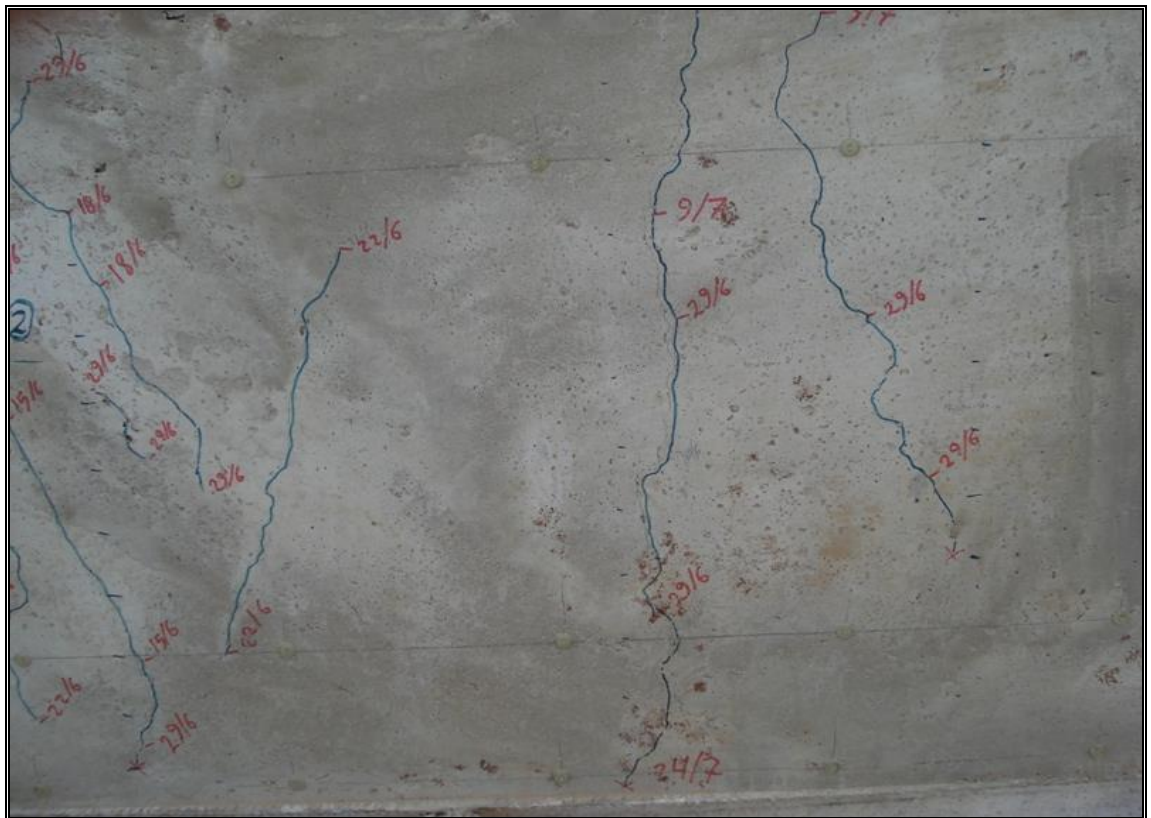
Final cracking pattern of fourth quarter of wall (4S)
